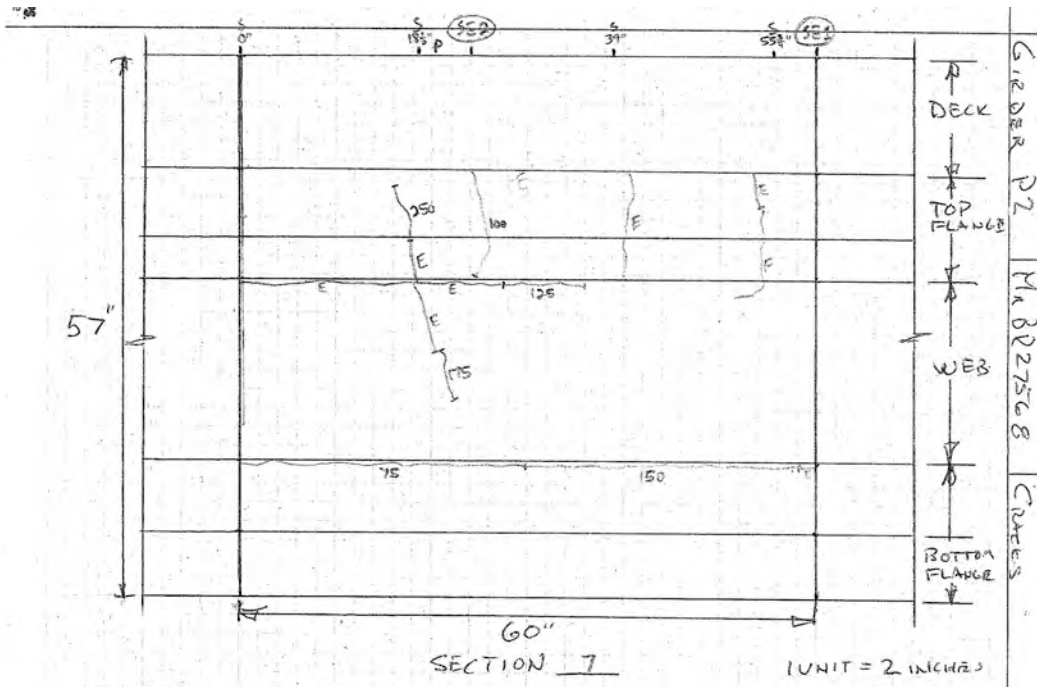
Girder P2 crack pattern – Section 7
